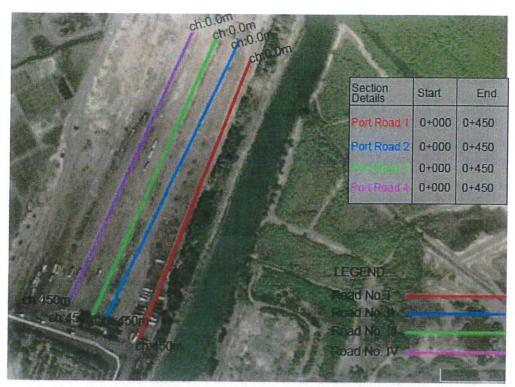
Truck Terminal Roads at Krishnapatnam Port
